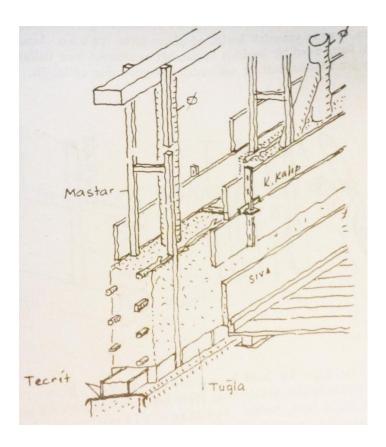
Construction of LWL on timber frame structure (Kömürcüoğlu 1962).
